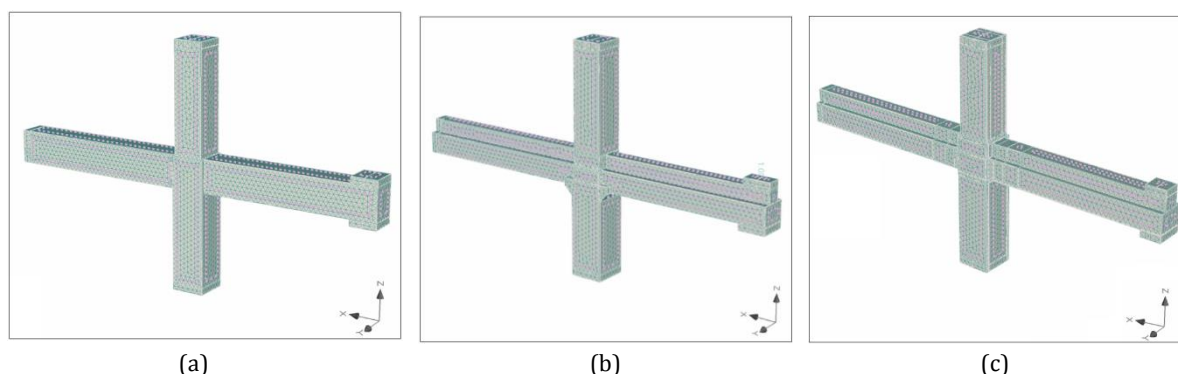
Finite element model of members: (a) Monolithic joint, (b) Common precast joint, (c) Suggested precast joint
